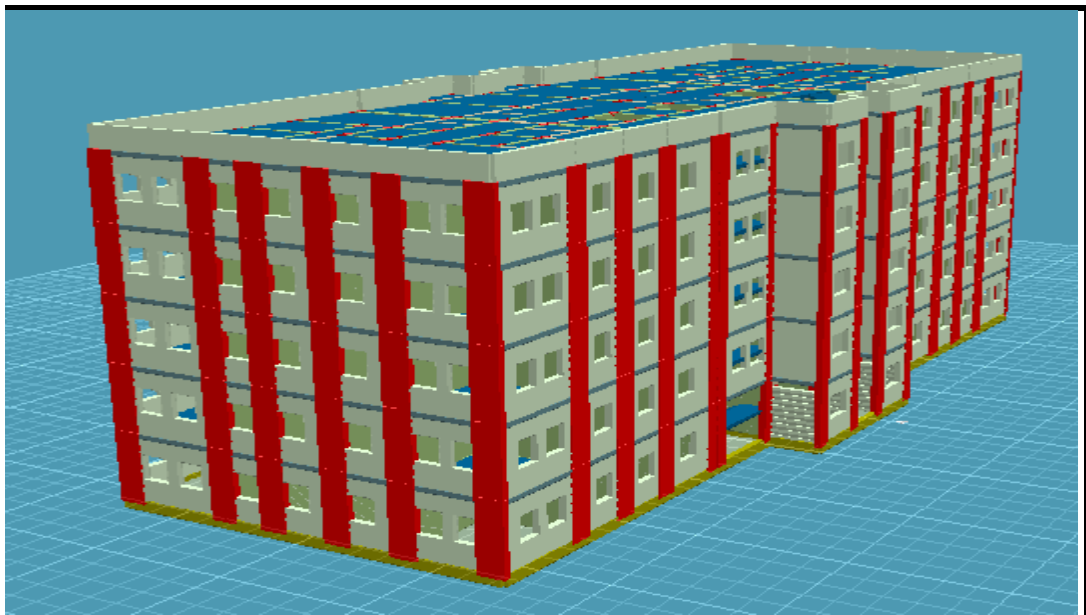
The 3D View of Buildings with Five Stories and Tunnel Formwork
